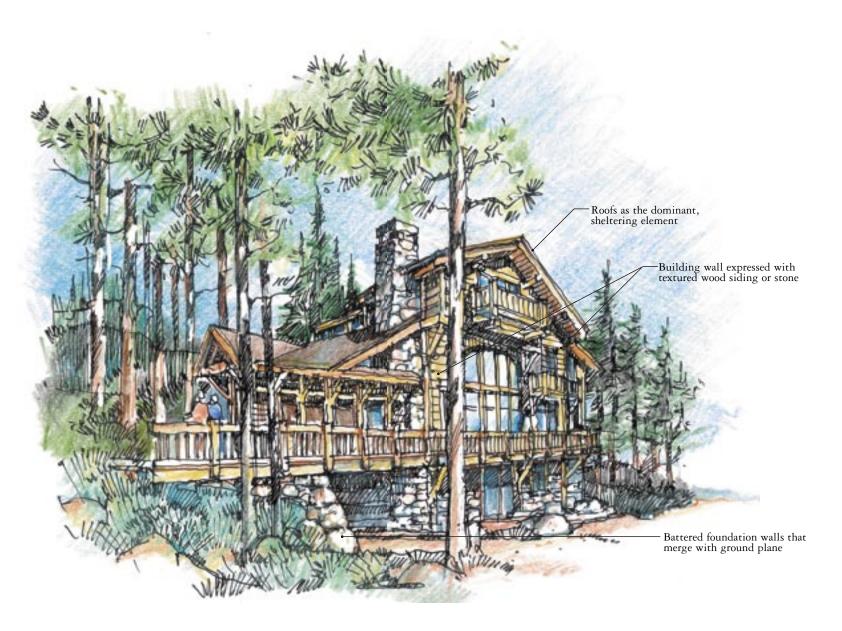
Building forms are to be designed with three main elements, foundations, walls and roofs
